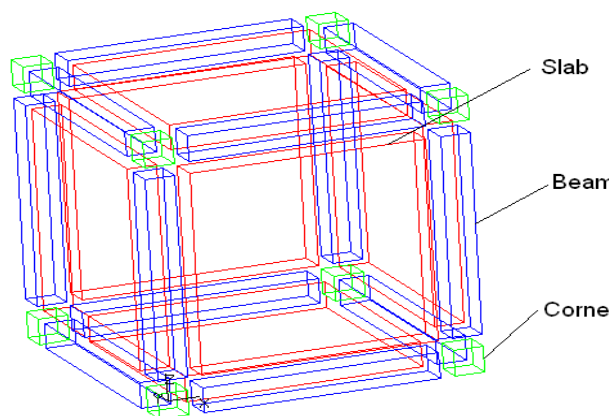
A HOLLOW BOX MODELED USING SLAB, BEAM, AND CORNER COMPONENTS
